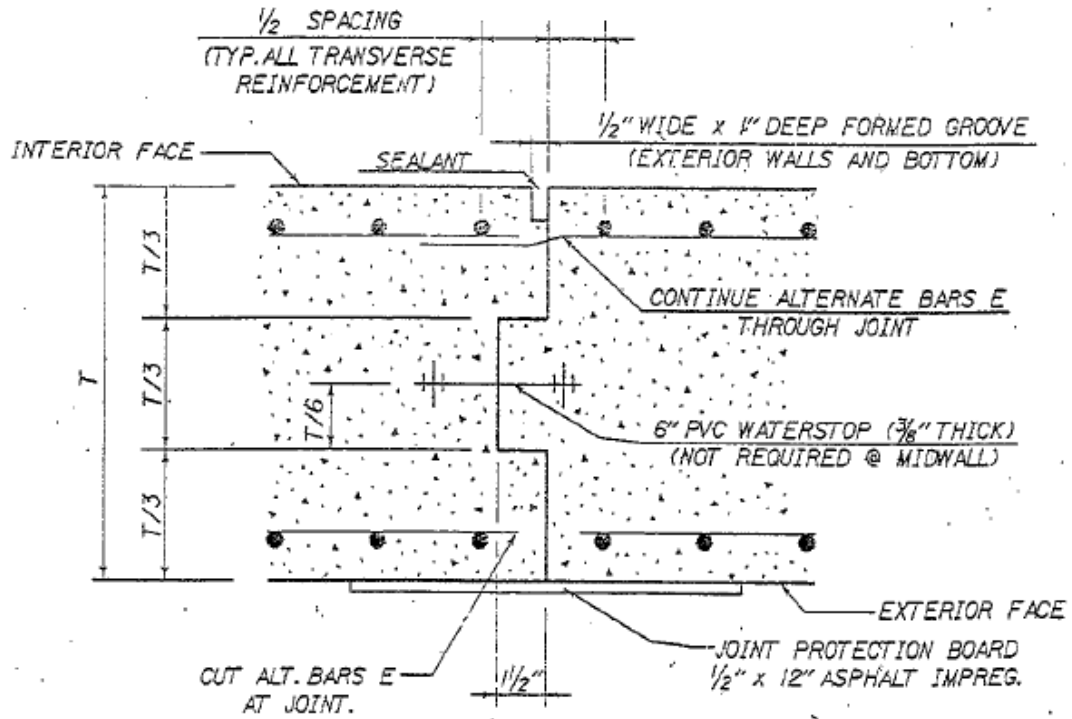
Transverse Contraction Joint Used in AEB Culvert at 257+69 (ALDOT 2001)
